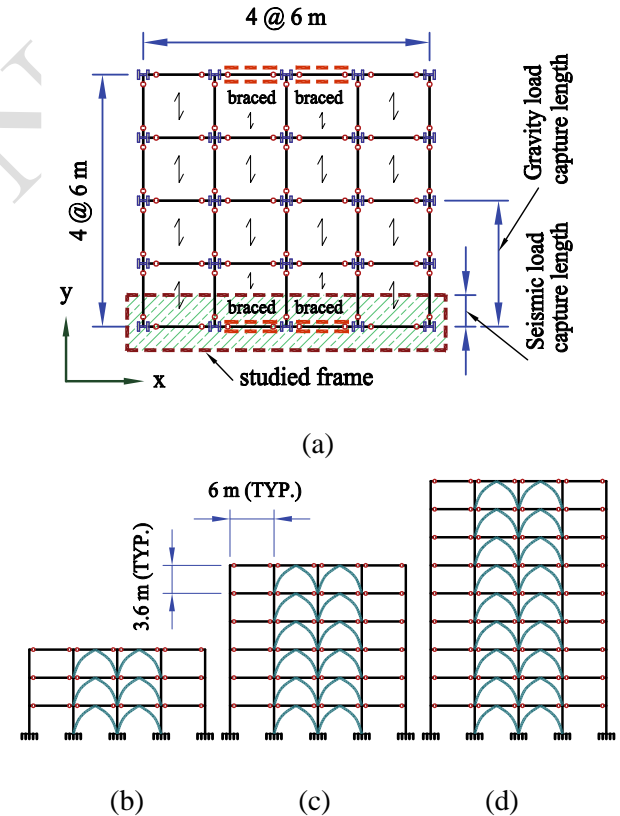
Concentrically braced frames braced with CSBs. (a) Plan view of studied building, (b) 3 story, (c) 6 story, (d) 9 story.
